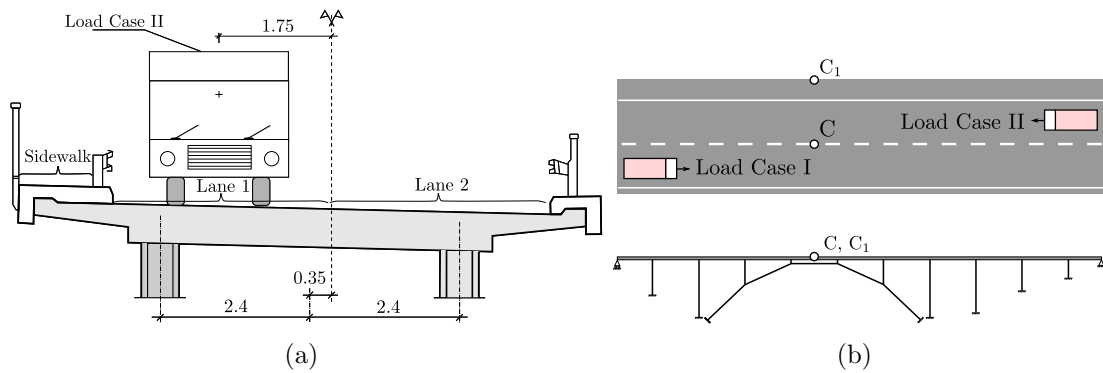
Load case considered in this study: (a) cross section, (b) plan view and elevation of the bridge, including some control points employed to refer the ongoing results
